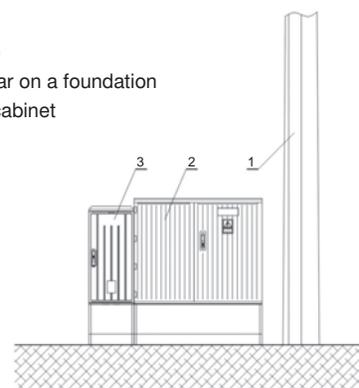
View of detached LV switchgear on a foundation with a pole MV/LV substation with a balancing measuring cabinet on a foundation (source: M. Socha, LAMEL)
